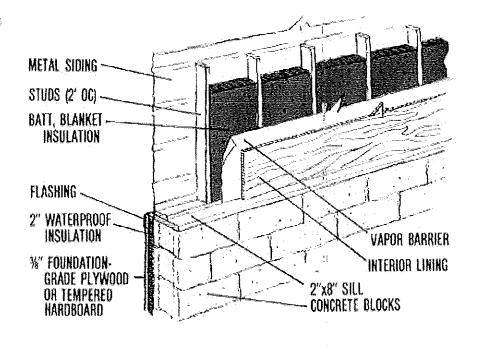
Concrete block and stud wall insulation (Upper wall R=13-15 if 2x4 studs, 20+ if 2x6 studs; lower wall R=12 if standard blocks, 16 if lightweight blocks with cores filled). Concrete block with stud wall above 32 inches is popular for housing large swine. Although blocks provide a 'pig-proof' wall surface next to the animals, they lose much heat and 'sweat' unless insulated.
